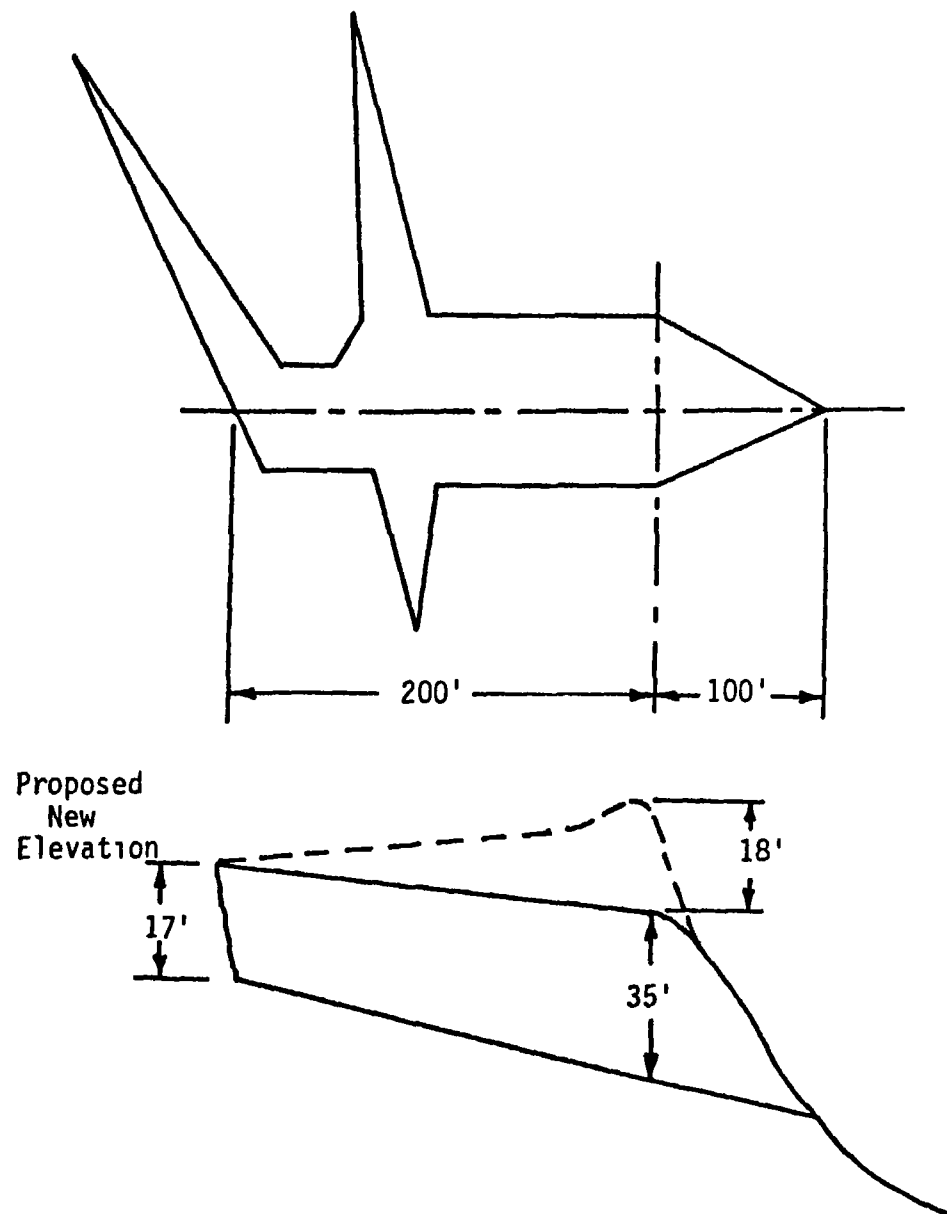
Plan and Profile of Erosion Site B and Proposed Fill Elevation
